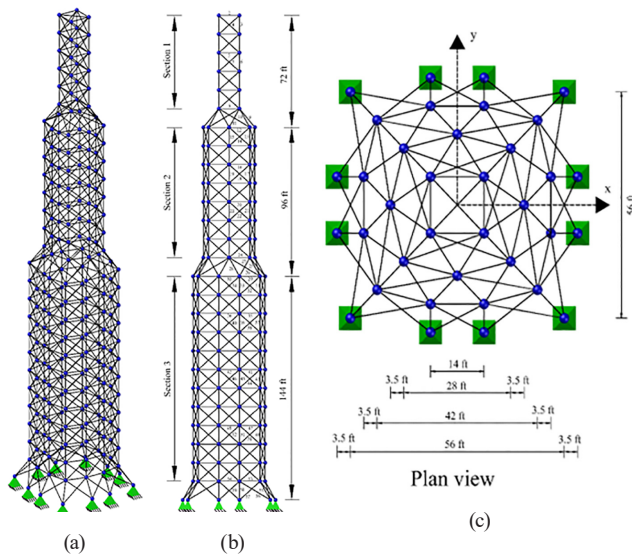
Schematic of a 582-bar tower truss structure (a) 3D view, (b) side view, (c) top view
